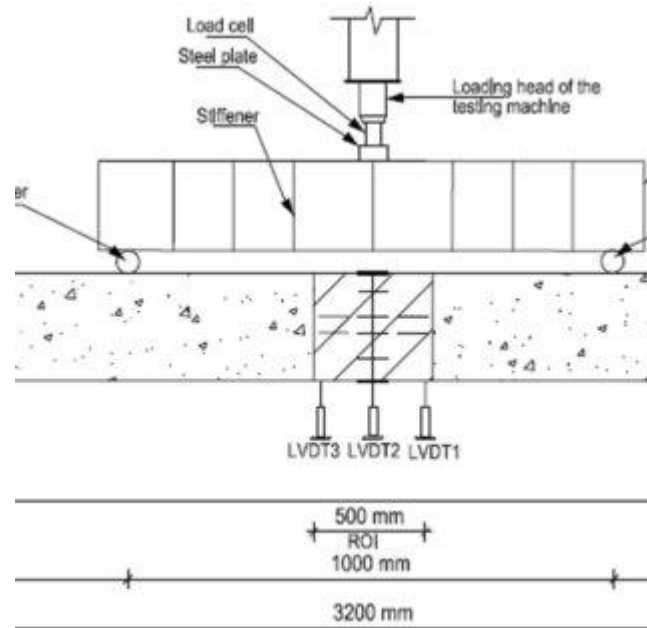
CFRP Laminate Bonding and Four-Point Flexural Testing of RC Beams
